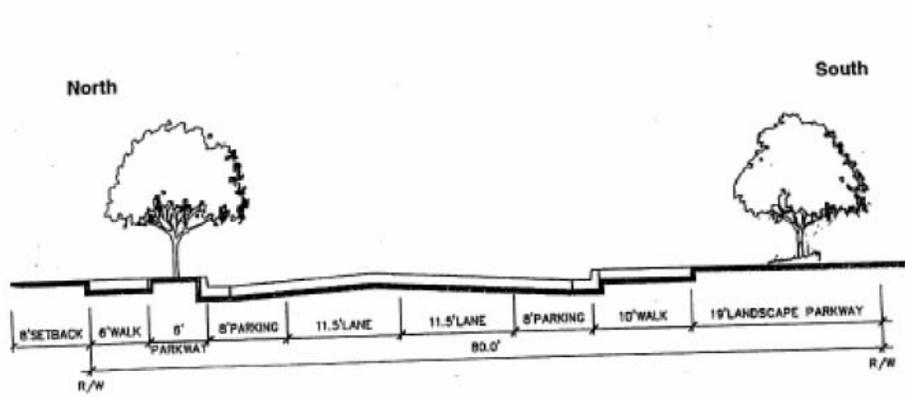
R STREET CROSS SECTION 3RD-19TH STREETS
